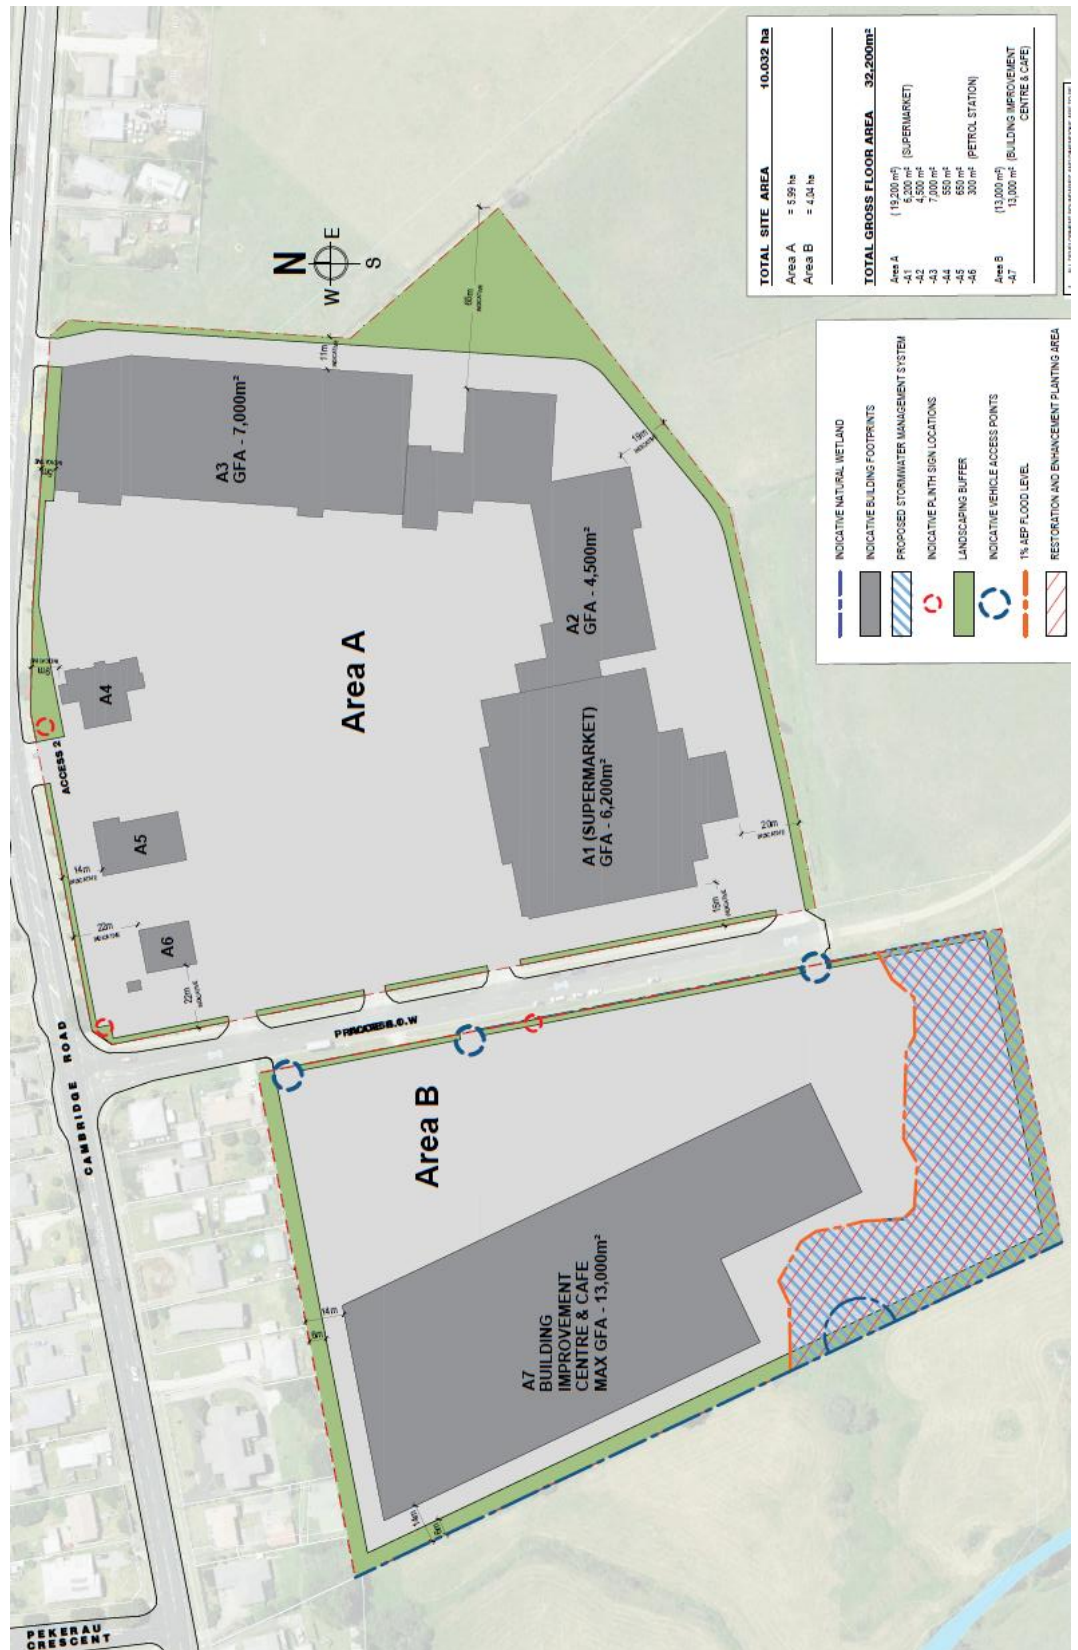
Revised Te Awamutu Large Format Retail Centre Plan
